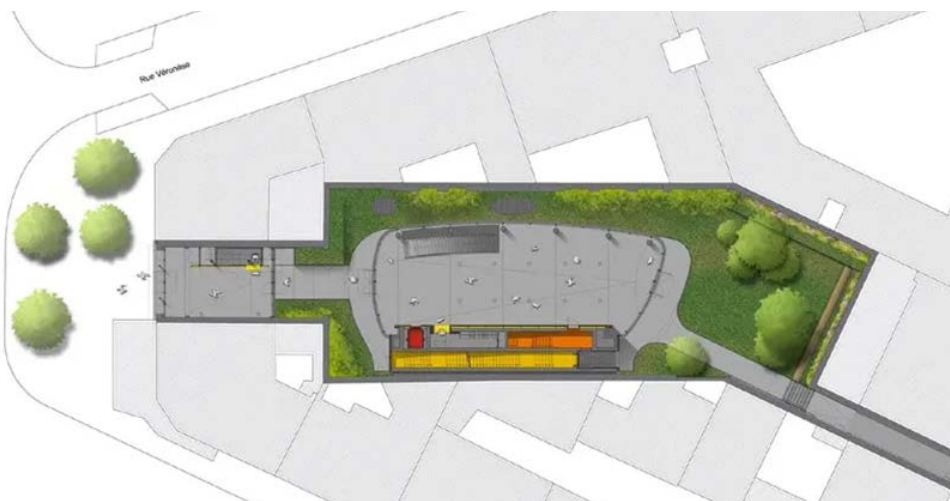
Pathe Foundation, Renzo Piano, Paris, France: Ground Floor (2)
